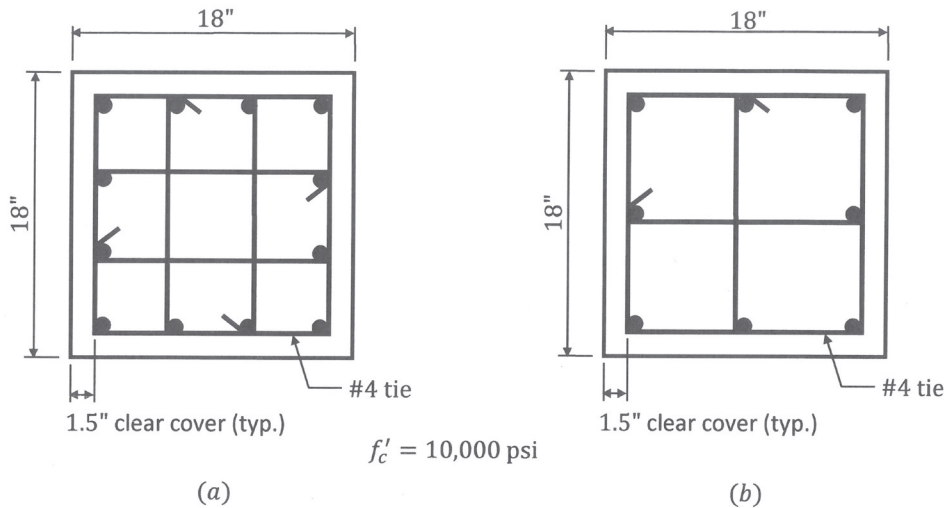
Reinforced concrete column. (a) Grade 60 reinforcement (b) Grade 80 reinforcement.
